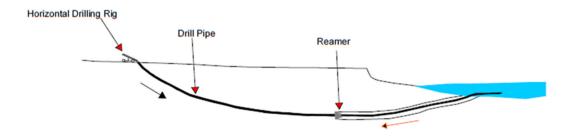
Typical HDD Installation at a Typical Landfall | not to scale
